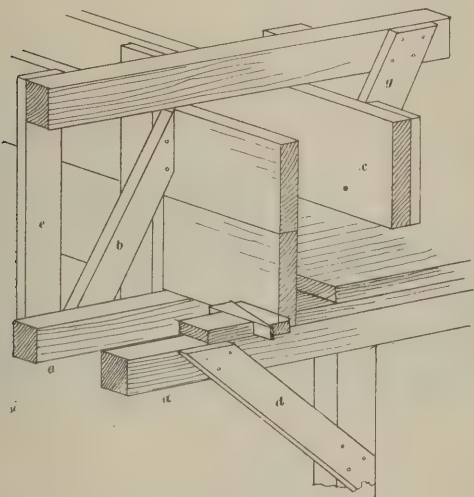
Showing How the Studding and Supports for the "Forms" Are Arranged in Lintel Construction.
